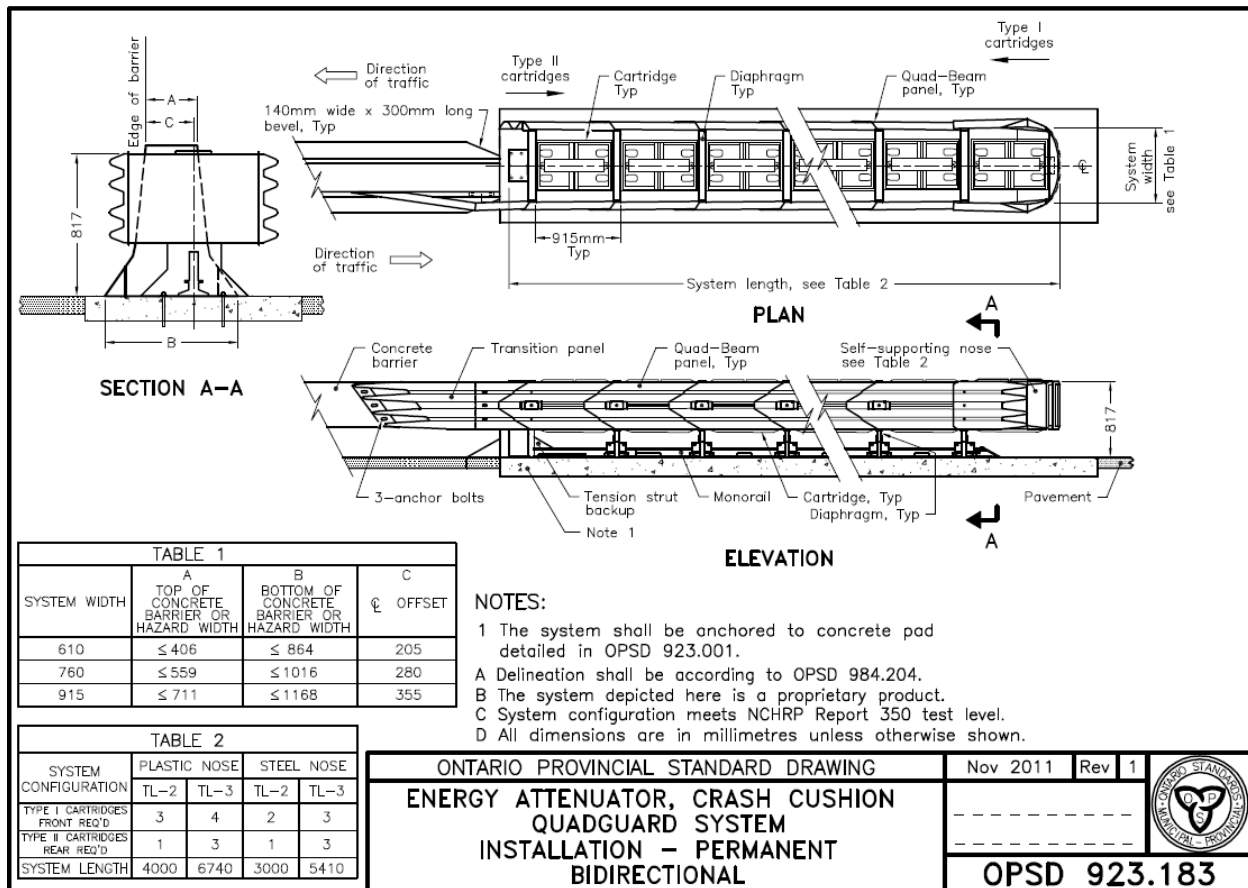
Guidrail End Treatment at northeast corner of Derry Road Bridge (OPSD 923.183)
